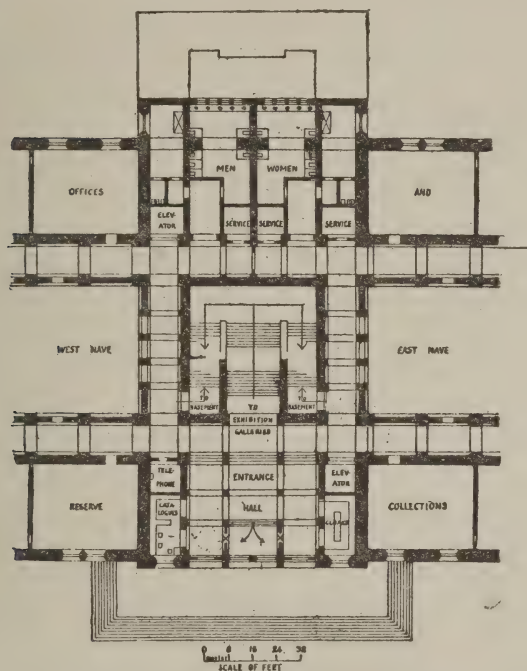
CENTRAL BLOCK: GROUND FLOOR
